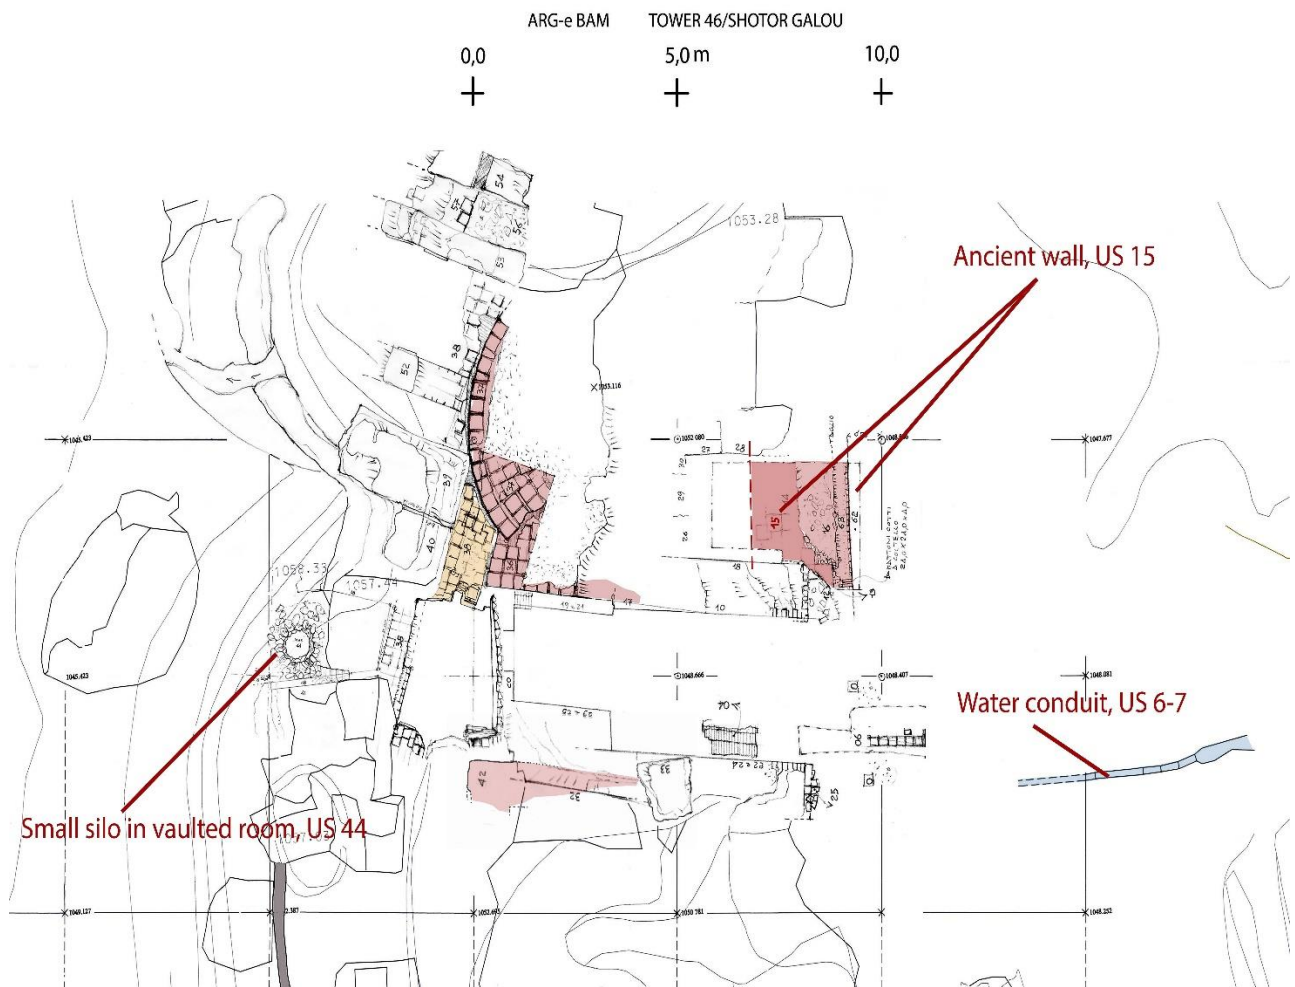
Excavation plan with indications of the ancient wall, water conduit, and silo (plan Vincenzo Torrieri).
